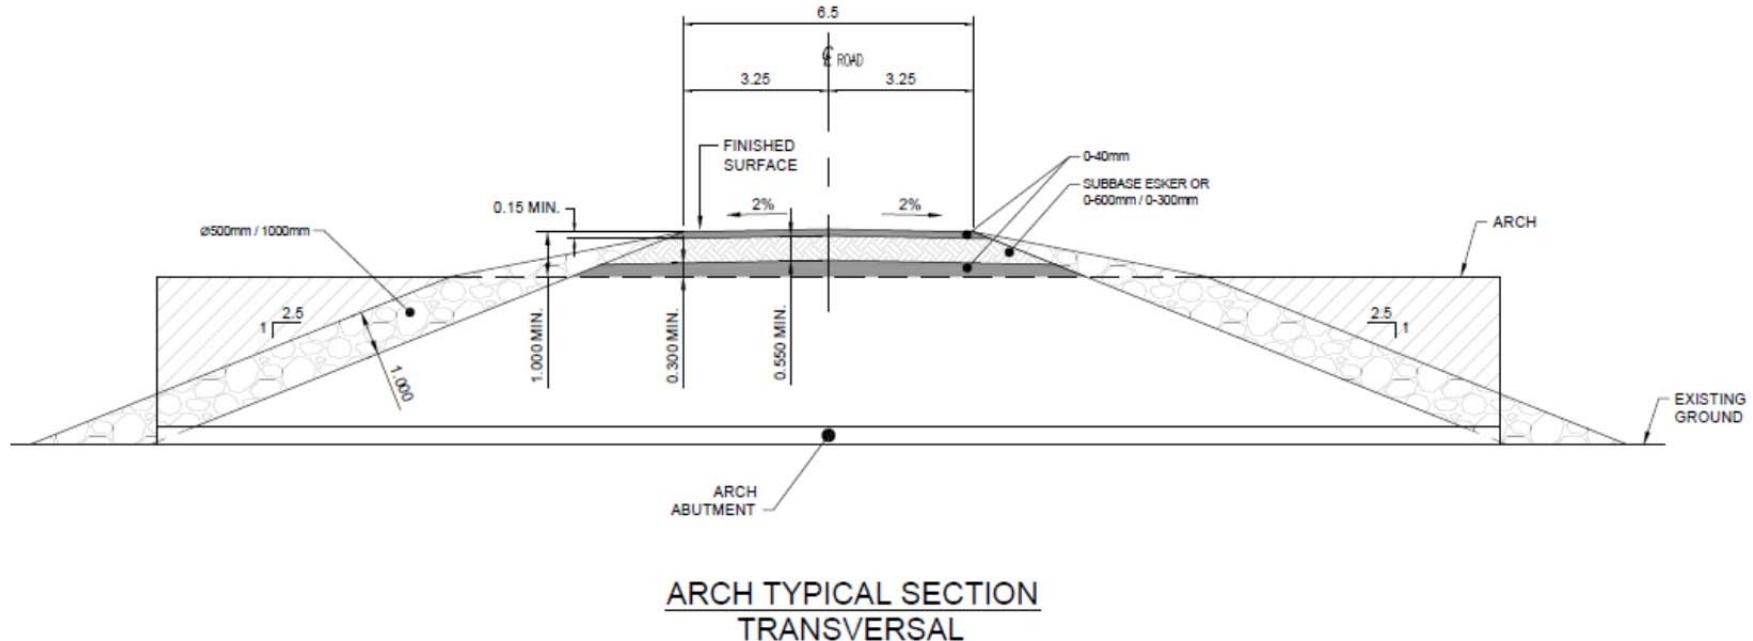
General Bridge and Arch Culvert Layouts
